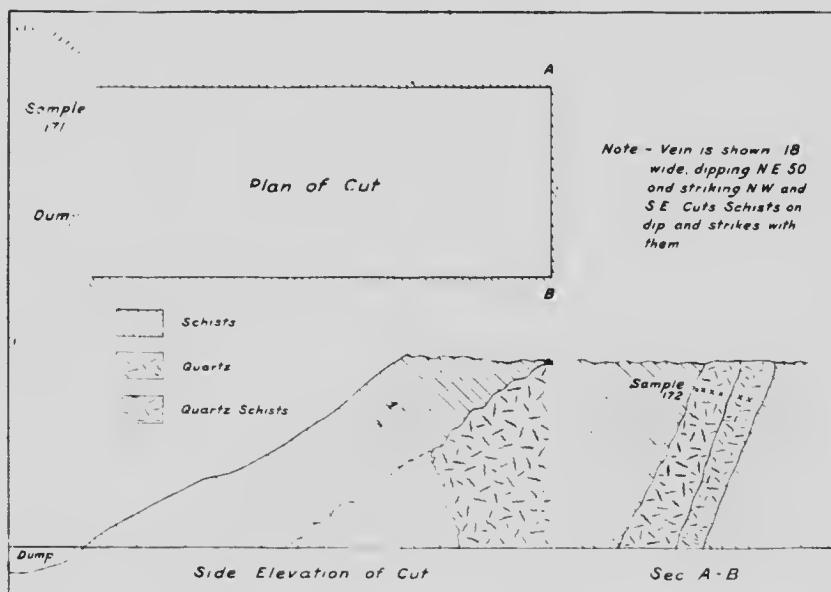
Plan, elevation of cut and section A-B on vein, Pioneer M.C.
